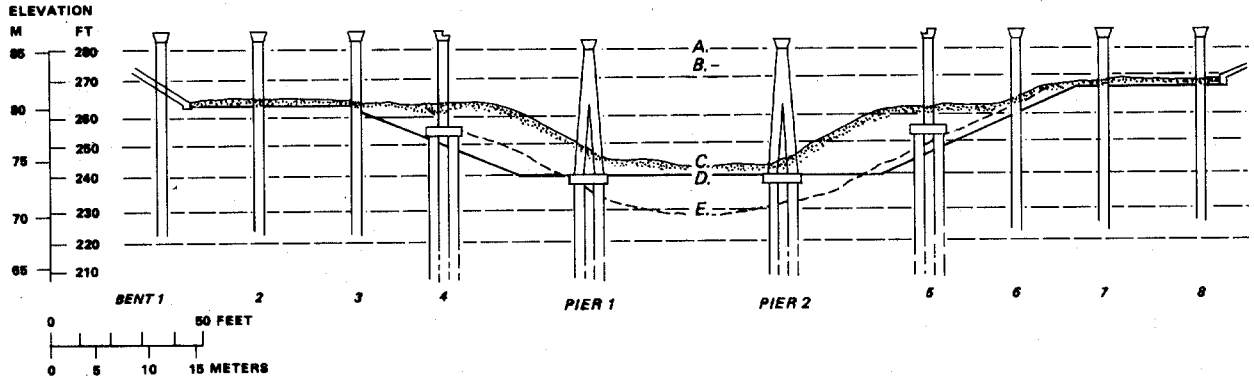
Channel cross section of Obion River at S-8005 bridge, showing bridge substructure, water levels, and channel bed at different dates. A, water surface elevation at bridge design flood, 50-yr R.I.; B, water surface at flood of 1-14-74; C, ground line from bridge plans, 1957; D, ground line from channel dredging plans, 1963; E, channel bed from soundings by Tennessee Dept. Transportation, after bridge failure.
